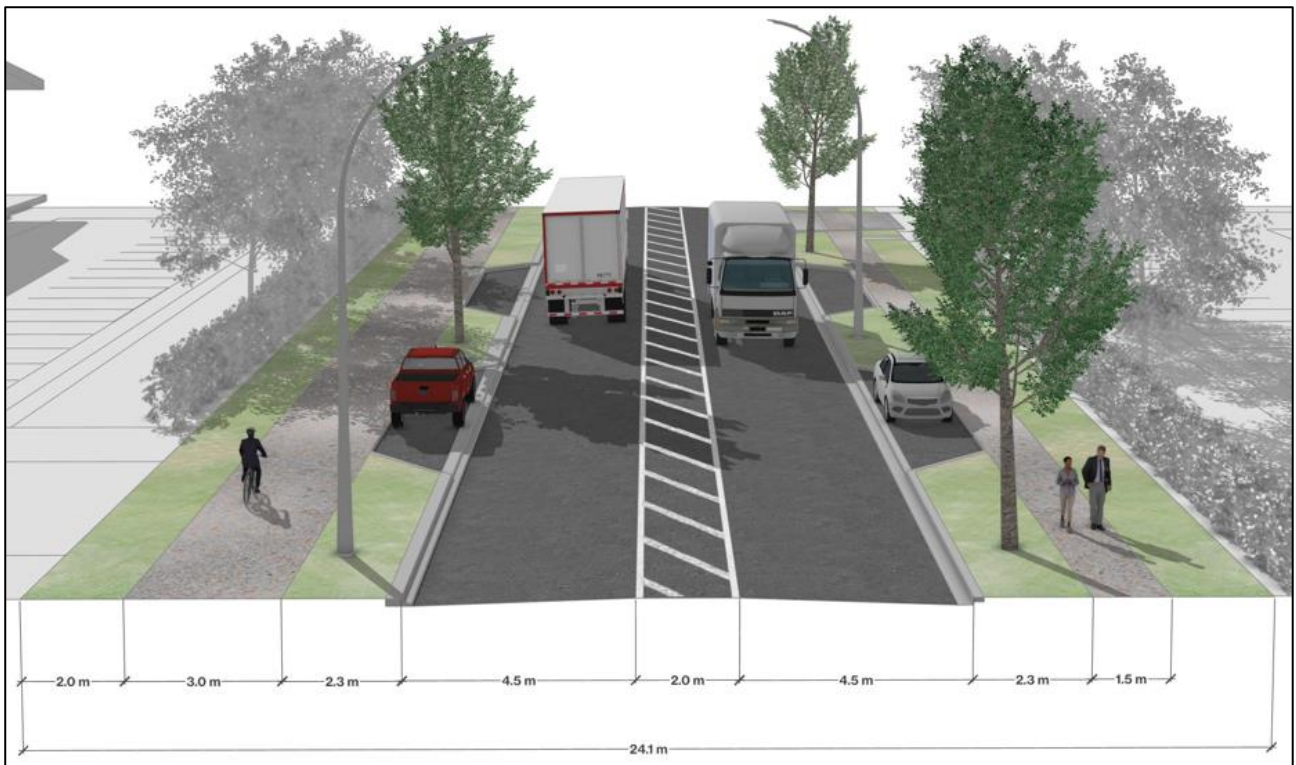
Indicative Typical Cross-section of East - West Local Road
